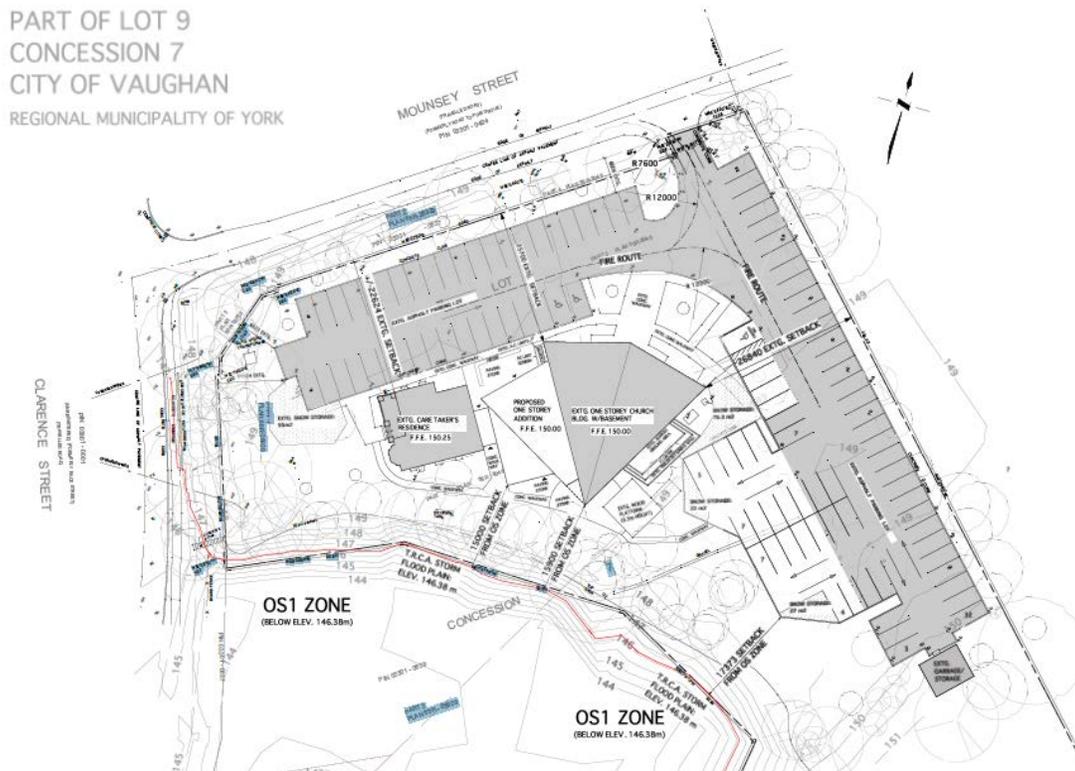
Proposed site plan (C.Y. Lee Architect Inc, 2019.).
